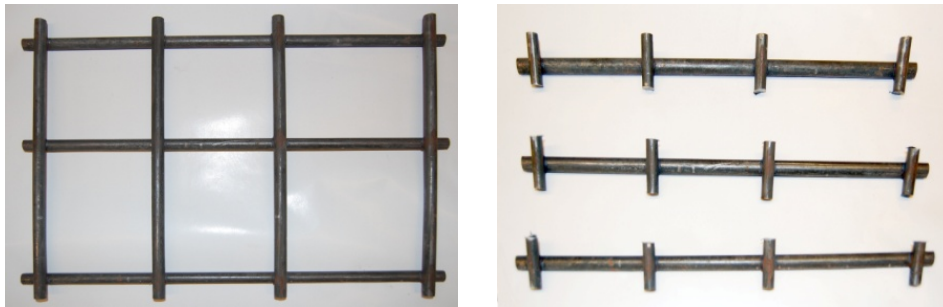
Steel Coupon Samples Including Welded Joints of WWR grid
